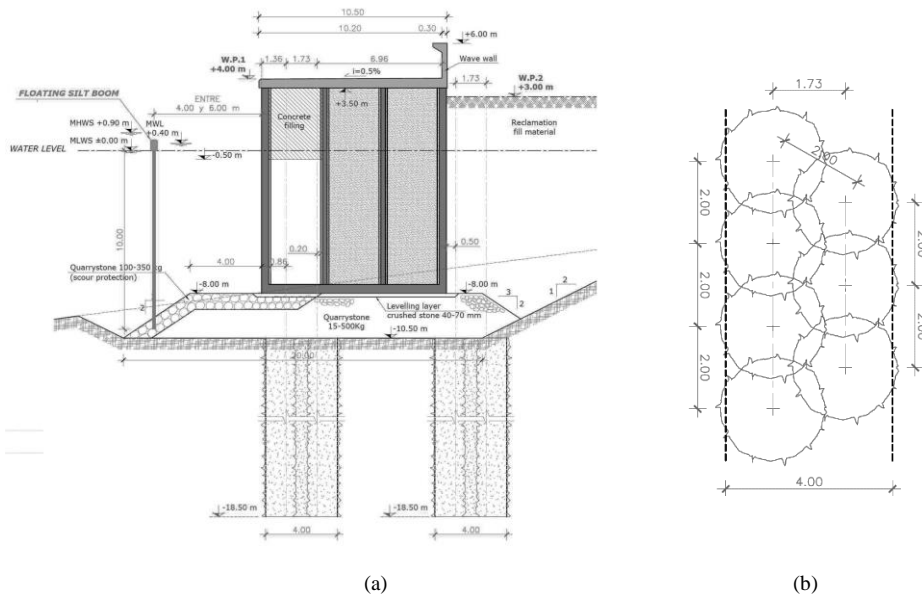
(a) Cross section of the jet grouting improvement solution. (b) Proposed Jet Grouting column diameter (2,50 m) and distribution to guaranty effective wall thickness of 4,0 m.
